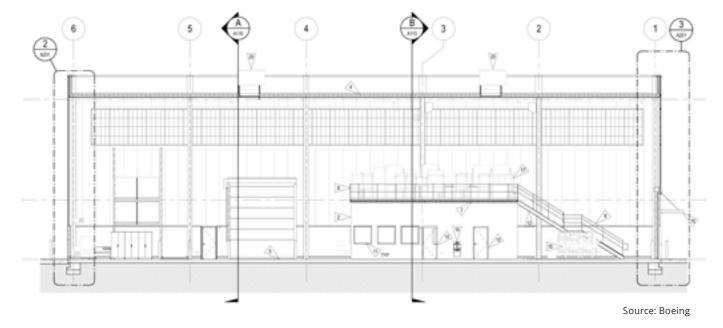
Blueprint of the building section looking east. This view shows a stairway leading to a catwalk.
